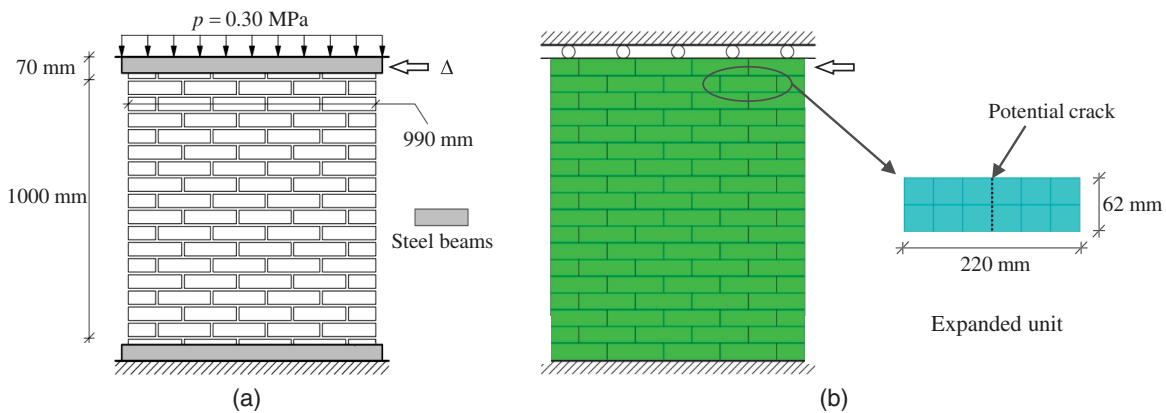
Masonry shear walls: (a) shear walls; and (b) SMM used for simulating the shear wall.
